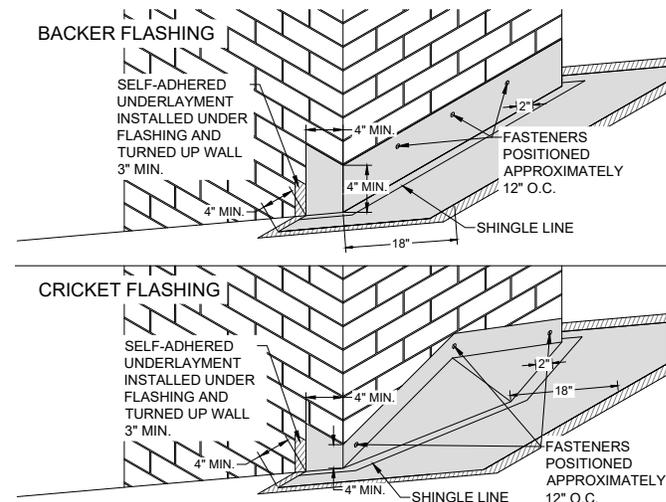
Chimney Saddle and Cricket Flashing Applications
